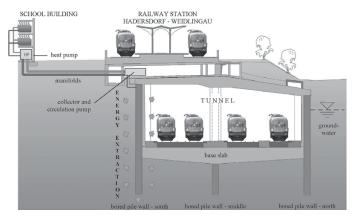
Schematic cross section of an energy plant as thermo-active tunnel ("energy tunnel"). One side wall of cut-and-cover tunnel used as energy wall. Bored pile walls (south-middle-north).
